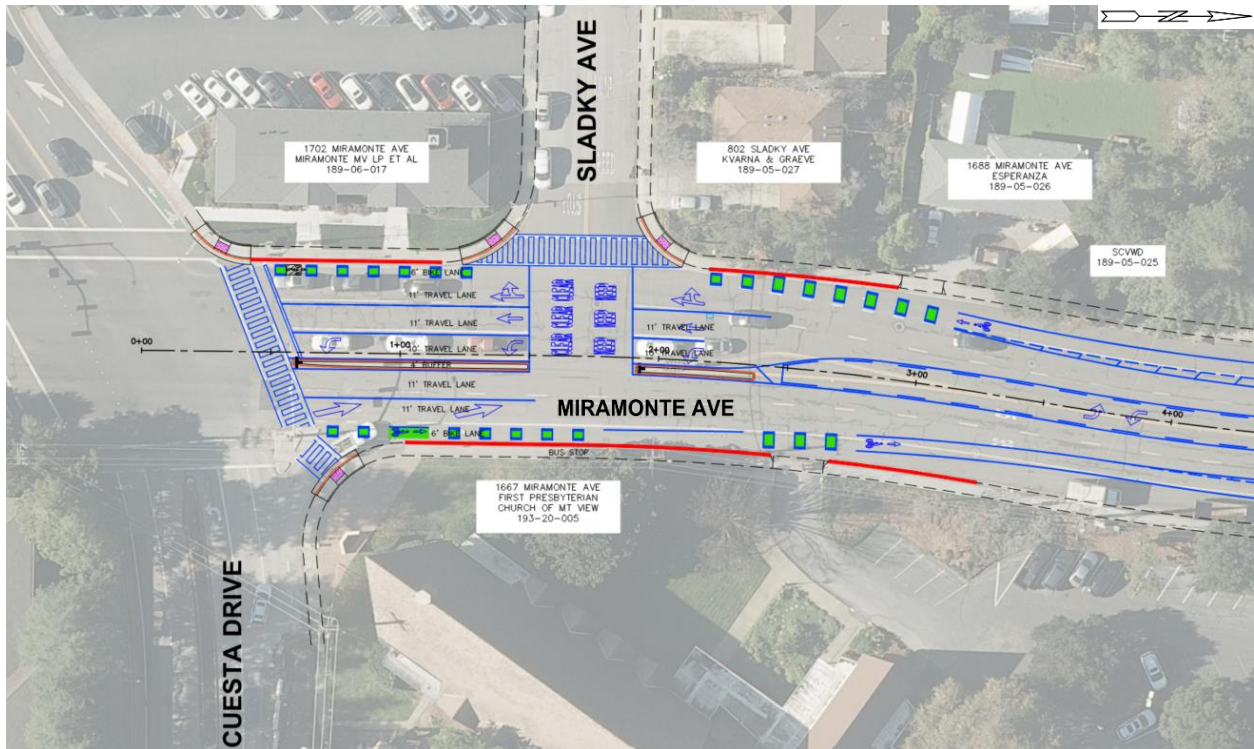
Cuesta Drive and Sladky Avenue Intersections
